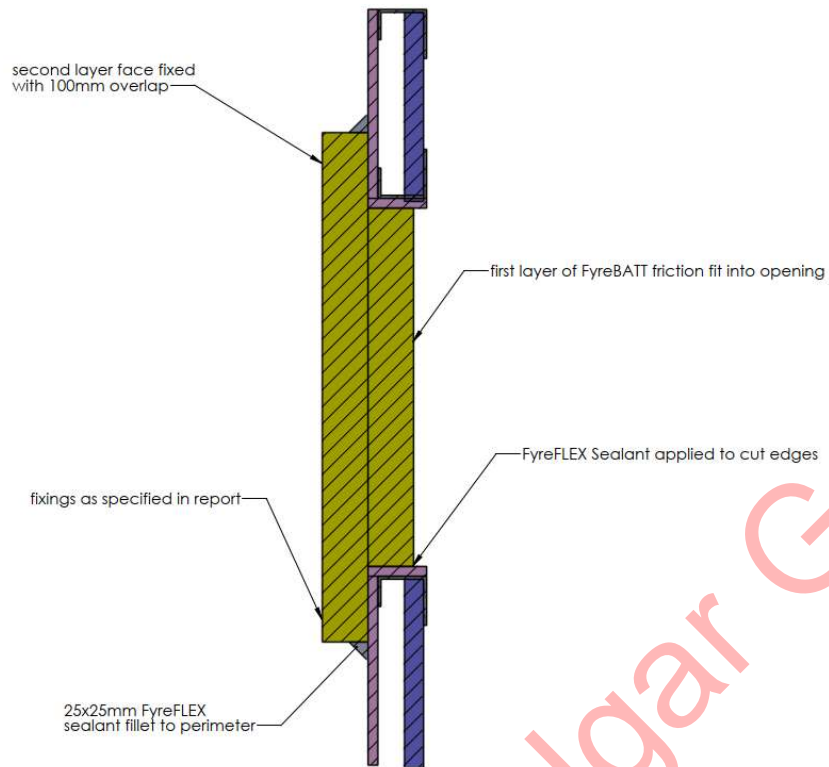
Patress fit FyreBATT in Shaftliner wall system
